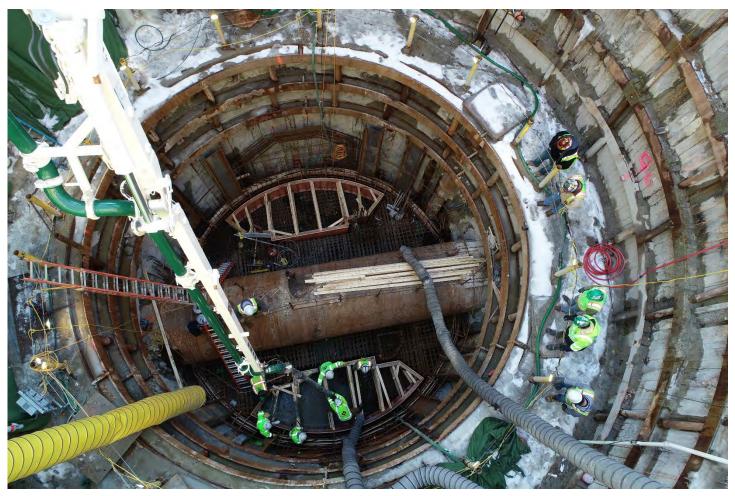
Aerial View of CS-12 Base Slab Concrete Placement
